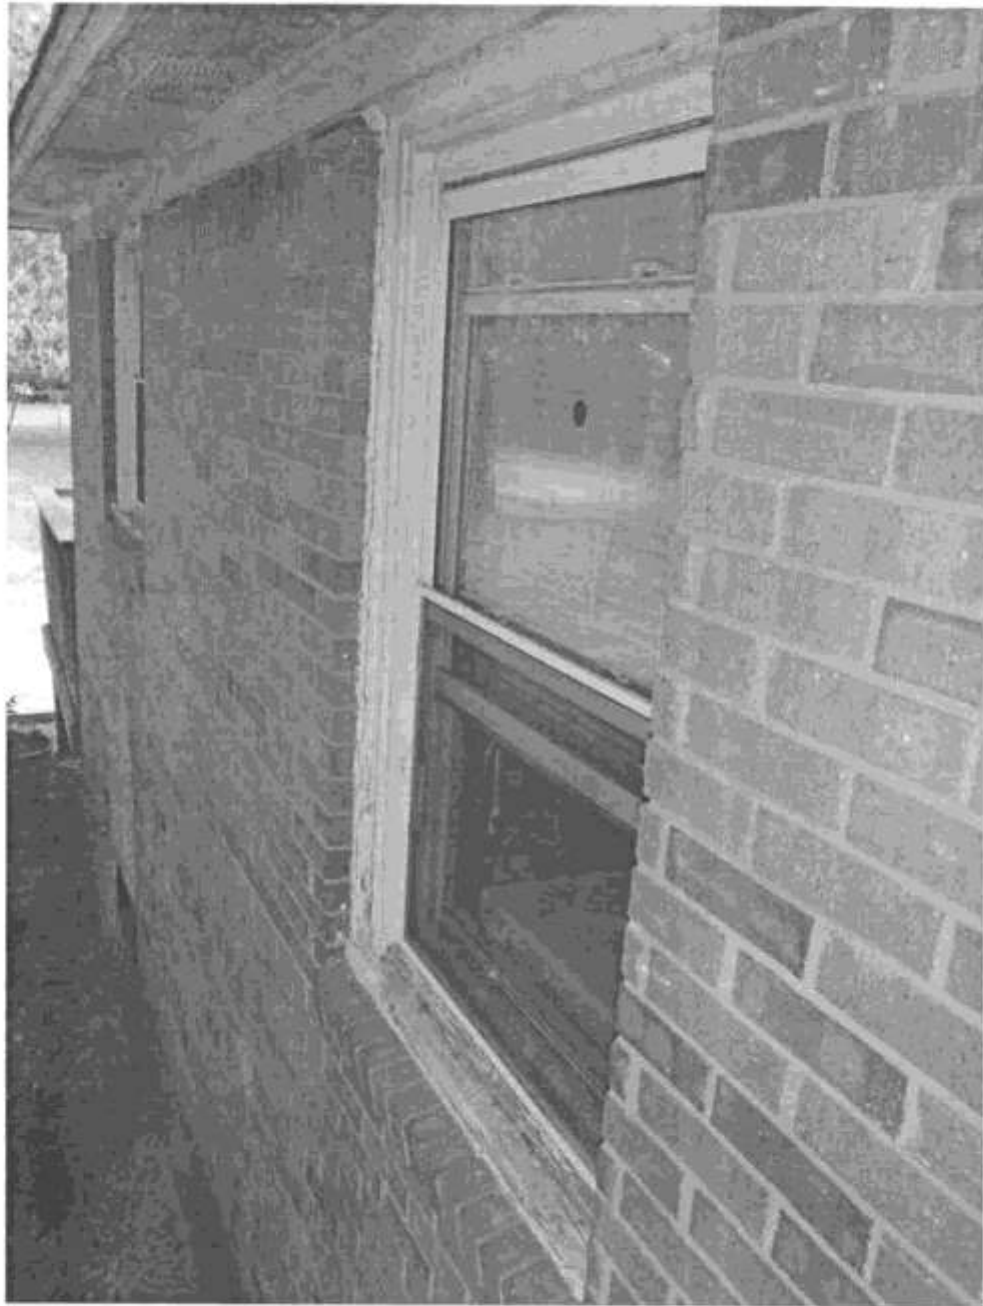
House – White Wood Fascias, Soffits, Crown Moldings, Trim Boards and Attic Air Vent and Frame – Side B
